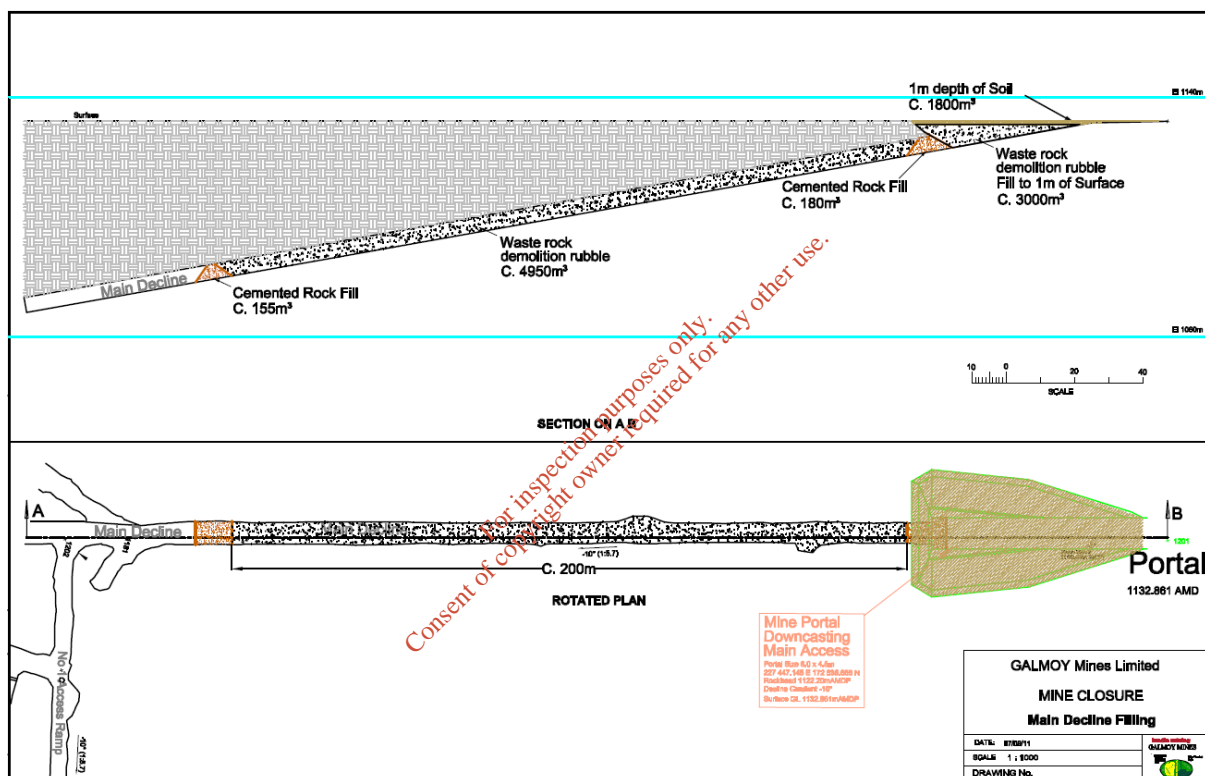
Section and plan view of decline backfill design used by Galmoy mine
